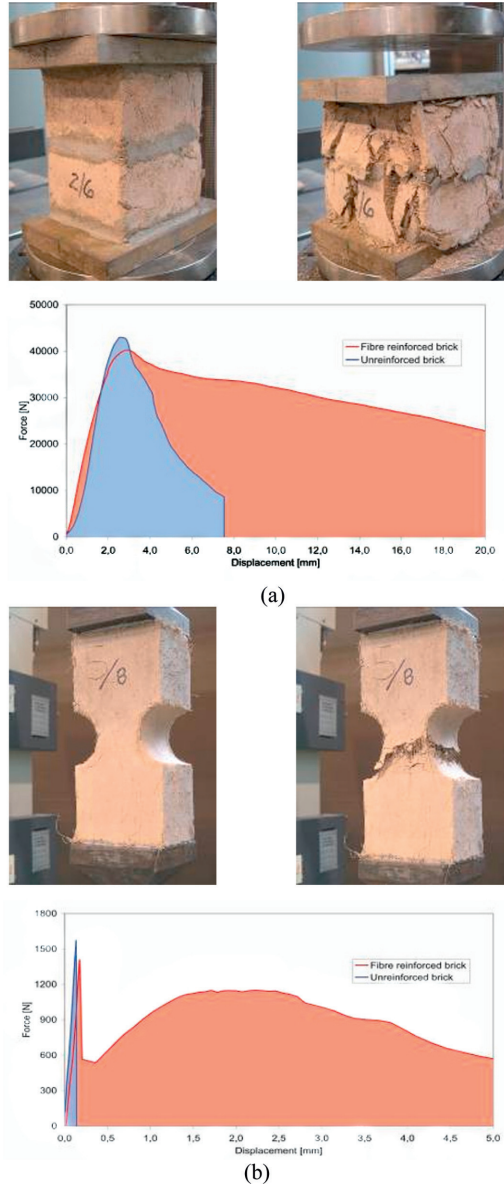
Laboratory tests proofed higher ductility under compression (a) and tension (b) of palm fibre reinforced adobe units.
